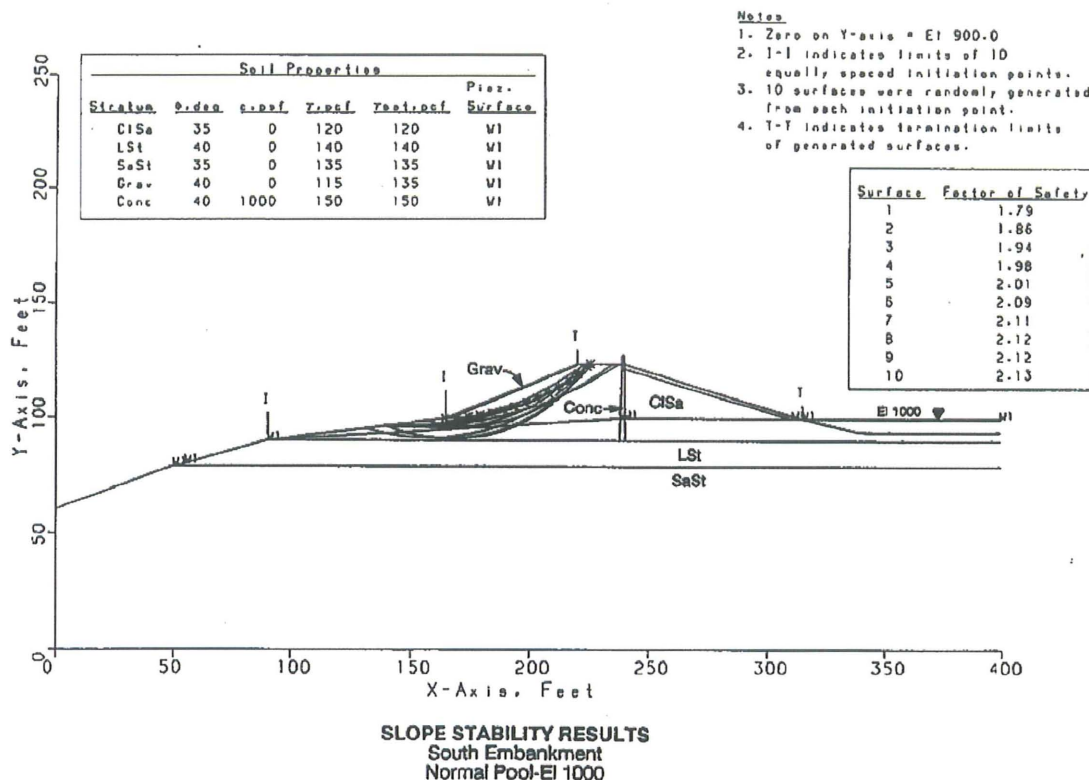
Embankment Section Slope Stability Cross Section (Reference 11)
